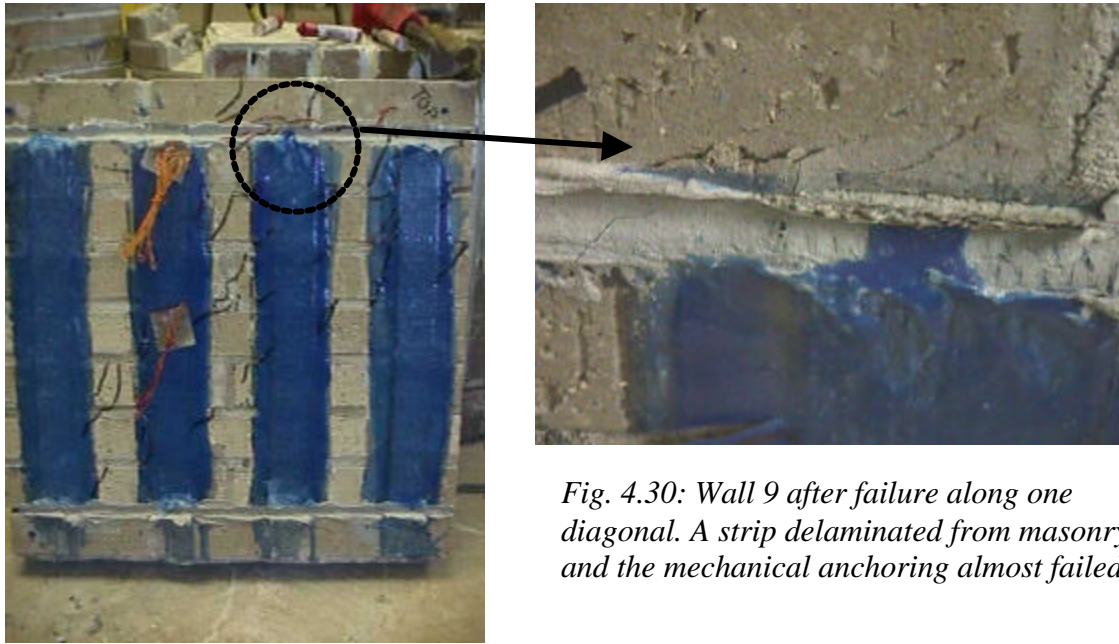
Wall 9 after failure along one diagonal. A strip delaminated from masonry and the mechanical anchoring almost failed.
